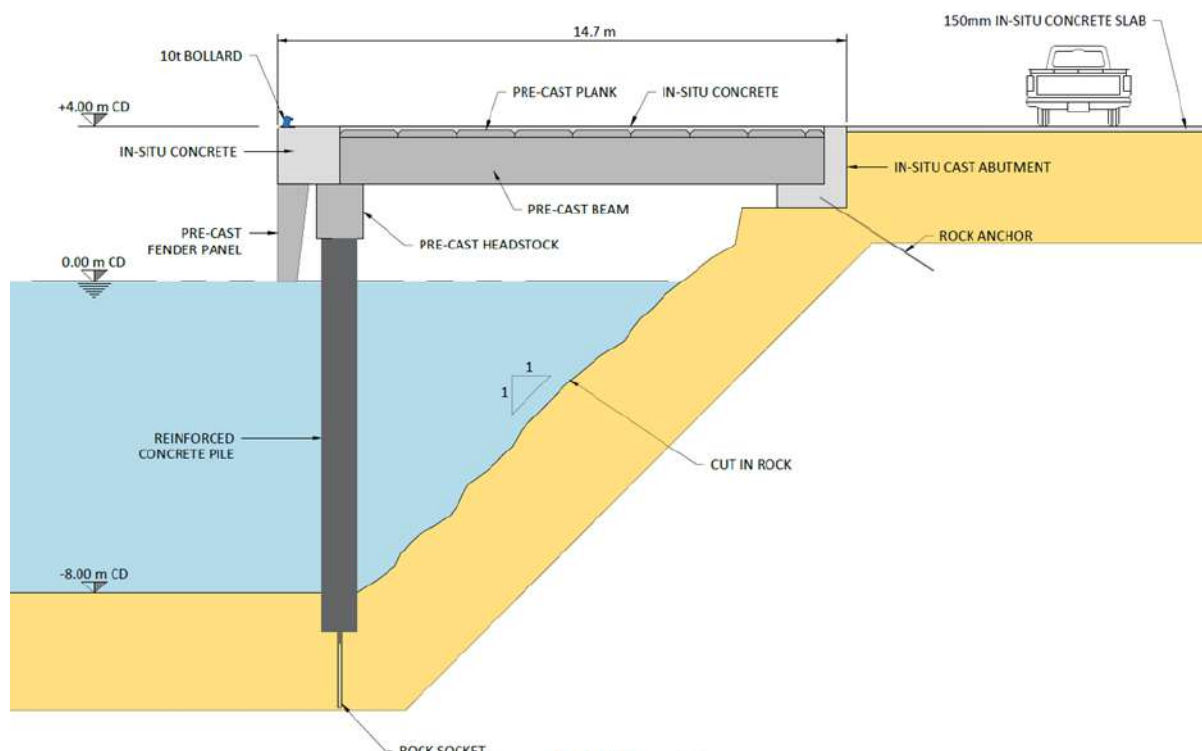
Cross section of the small craft harbour deck on pile structure
